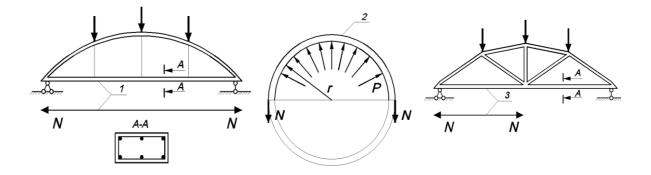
Axial tensile members: 1 - a tie of an arch; 2 - a wall of a tank circular in plan; 3 - a bottom chord of a truss
